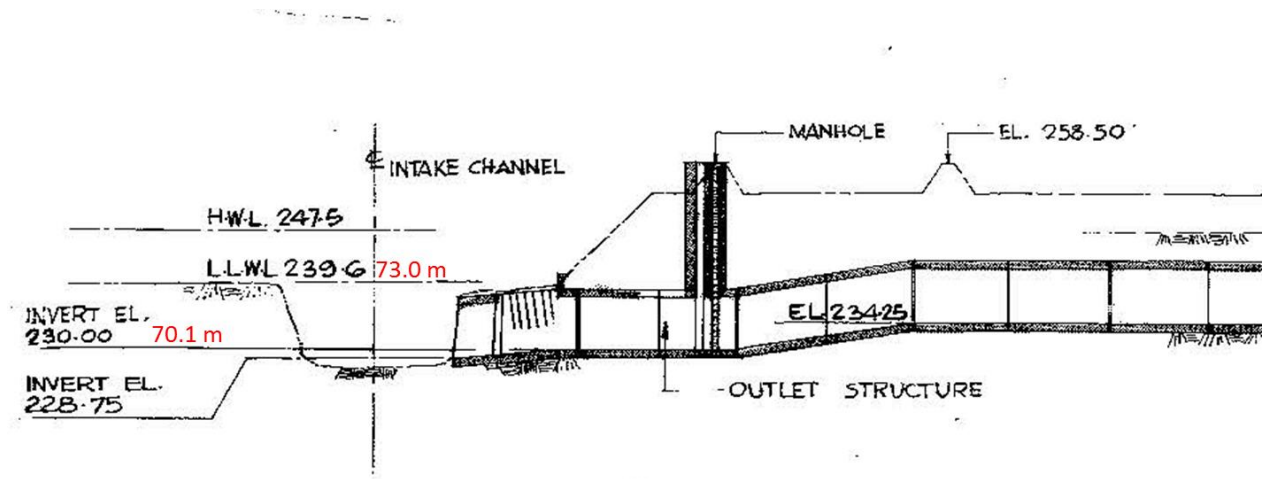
Section view of outlet of recirculating pipe from Units 1 and 2 (ref. NA21-D H-00000-7148_DRG_000_v03)
